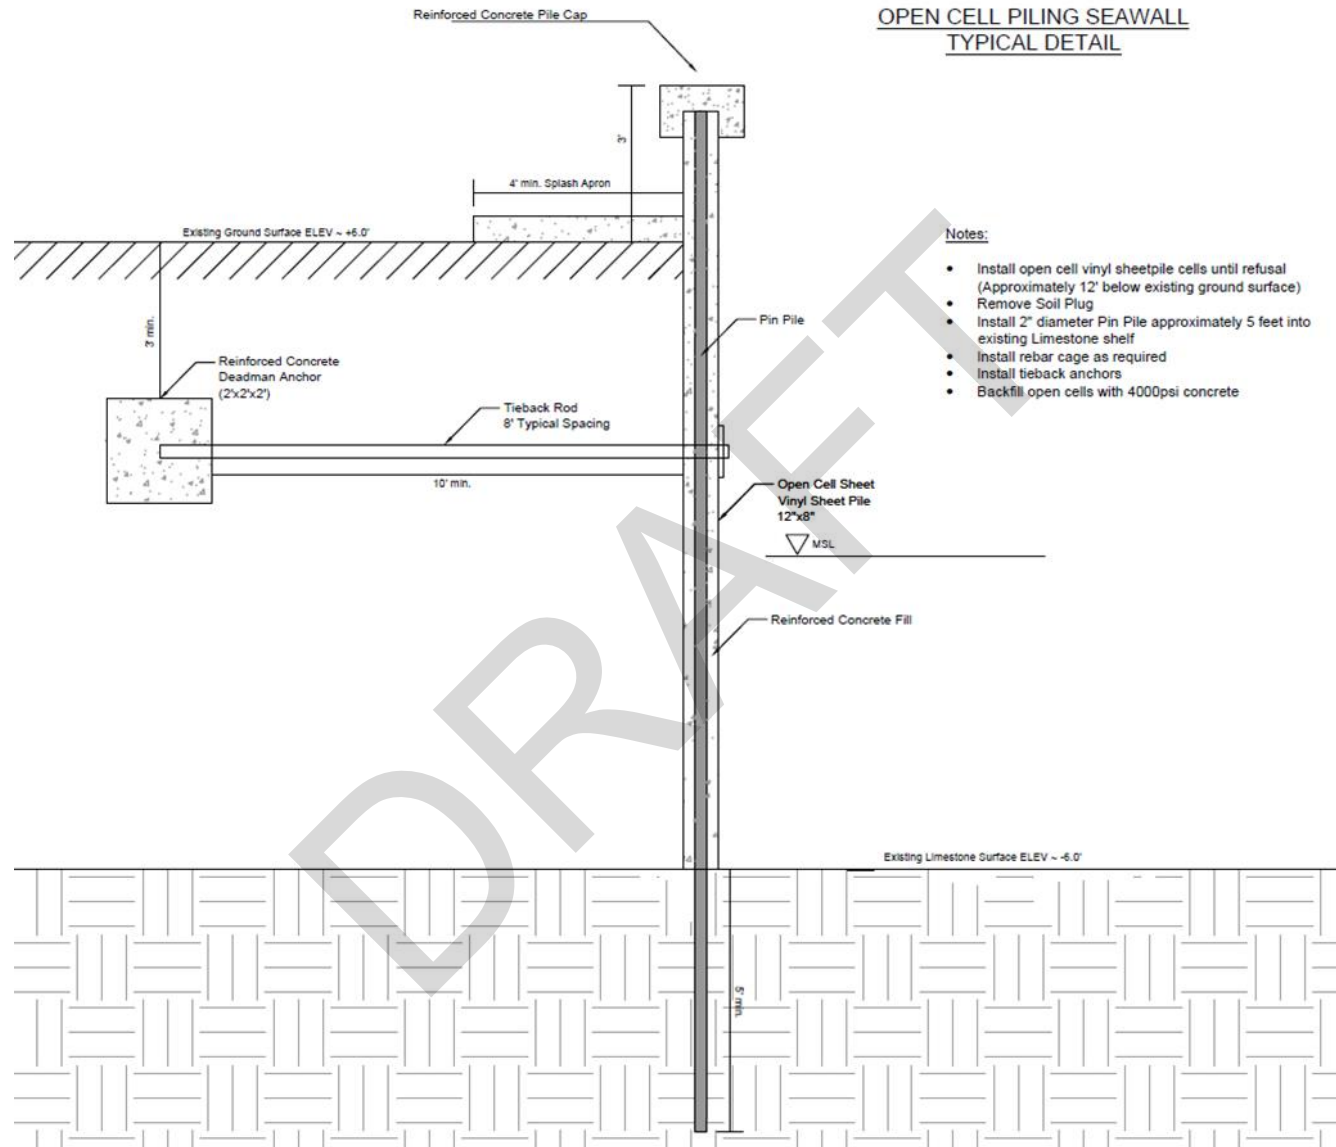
Open Cell Piling Seawall. Schematic of the proposed open cell sheet pile alternative (Alternative 3). Schematic provided by USACE.
